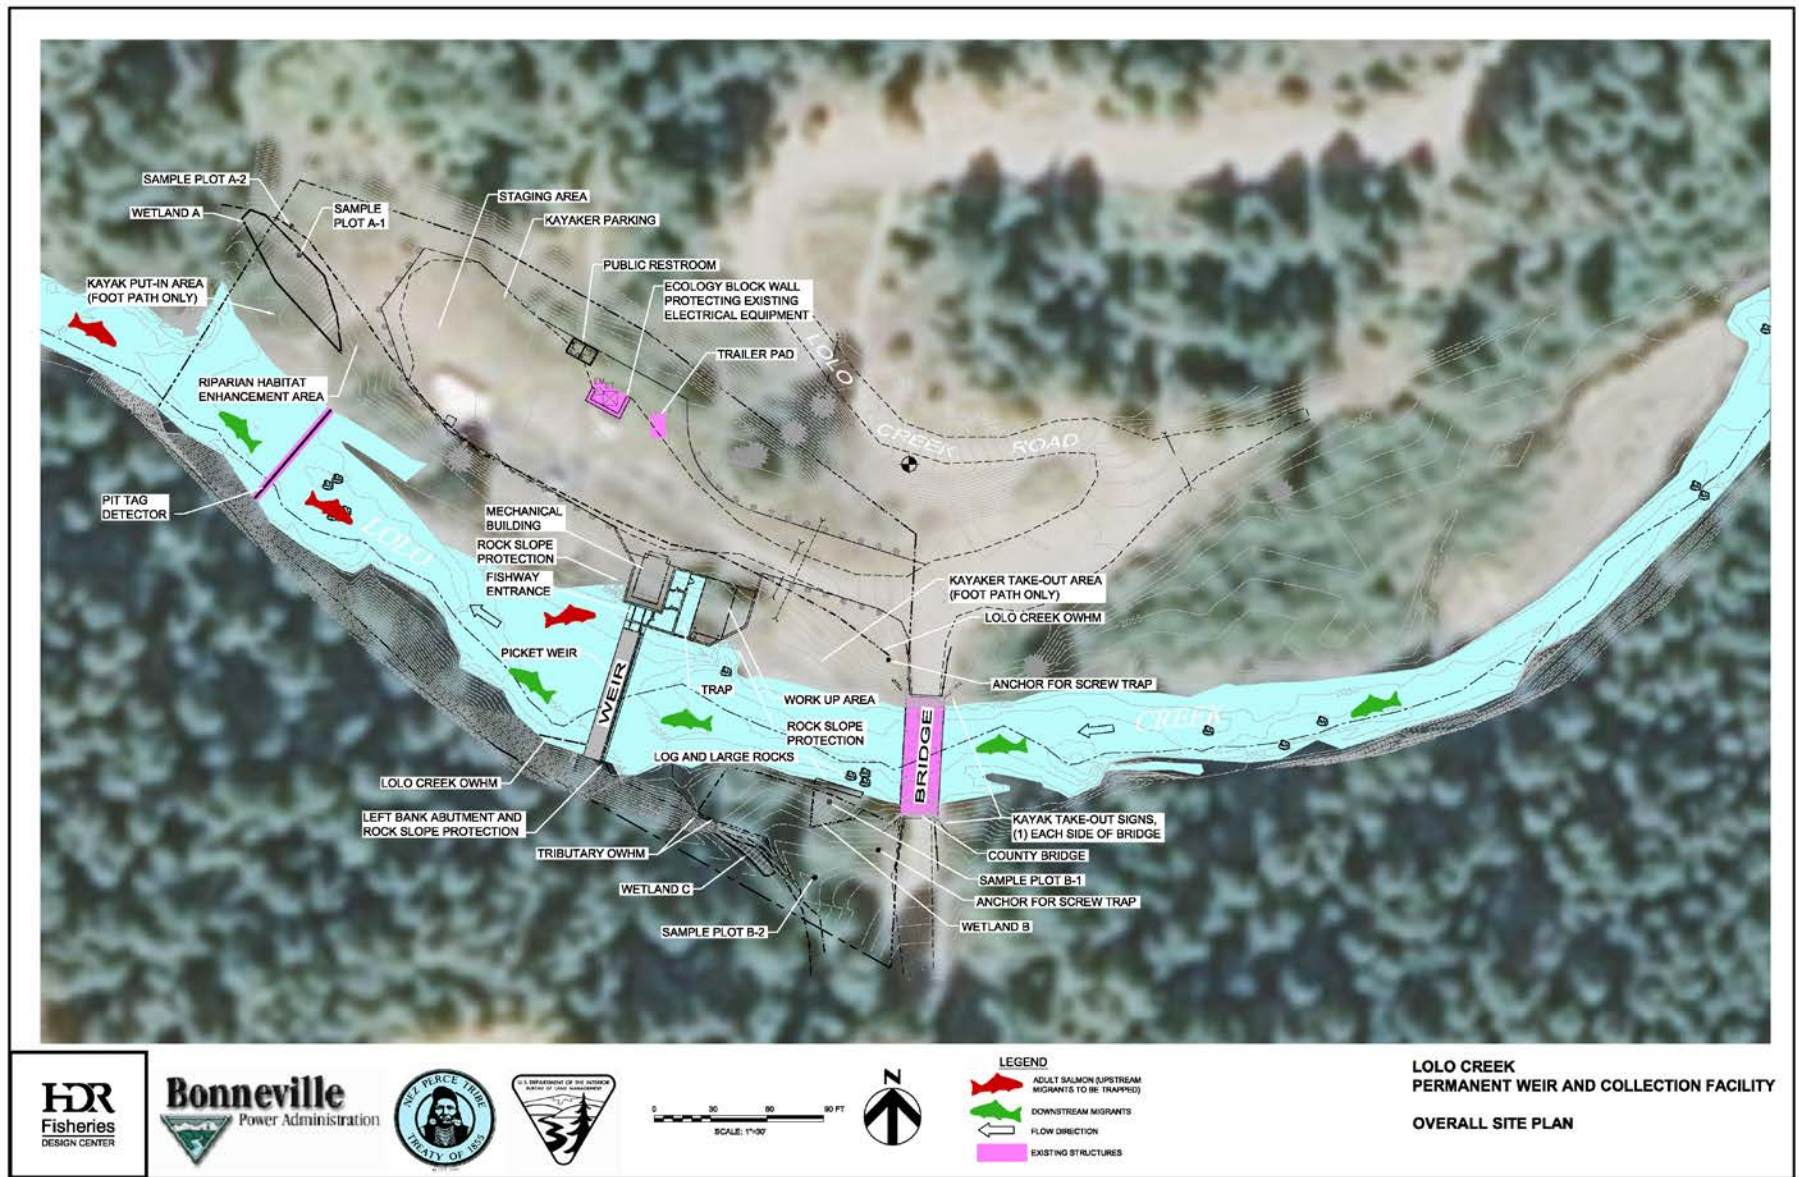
Lolo Creek Permanent Fish Weir, proposed site plan.
